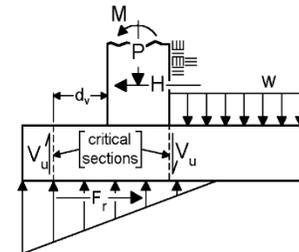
Example of Critical Section for Shear in Footings
